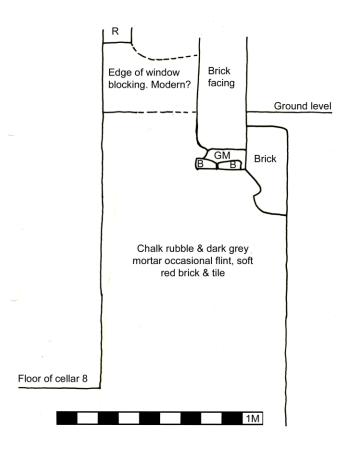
Cellar 8. Section cut through the east wall for a fire escape. Looking north. GM = dark grey mortar. B = brick. R= Reigate stone.
